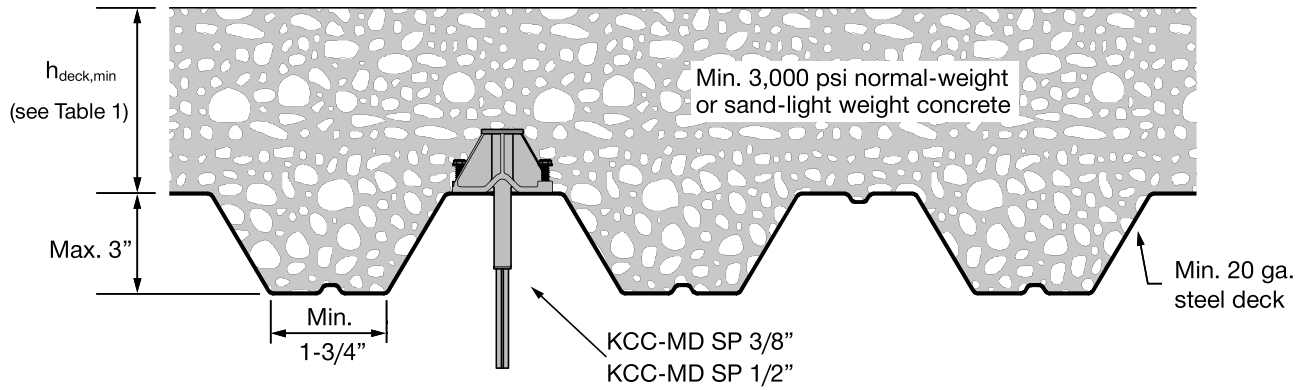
A — Installation of KCC-MD inserts in the soffit of concrete filled metal deck floor and roof assemblies-over upper flute (B-deck and W-deck)
